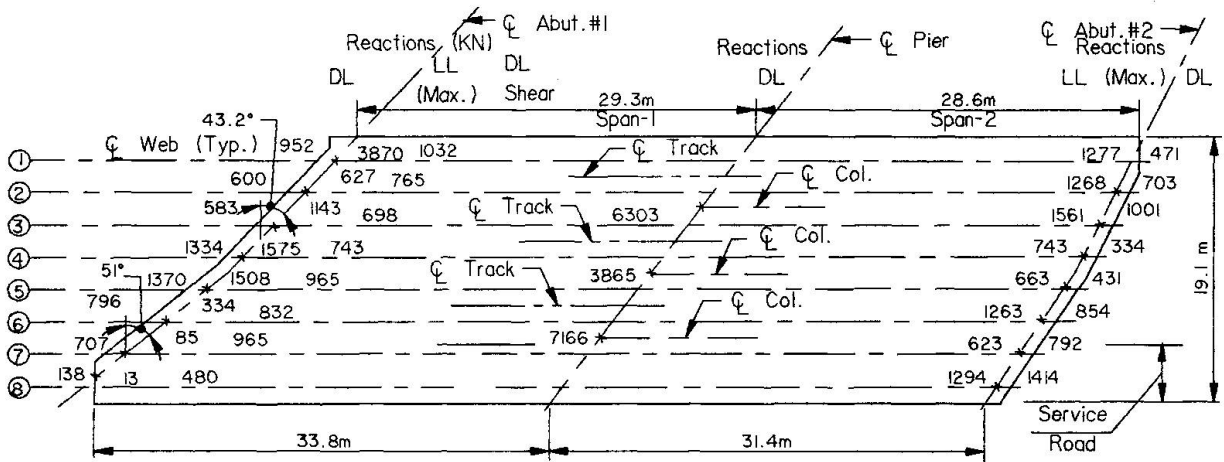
Sectional Framing Plan With Support Reactions - SPRR Bridge
